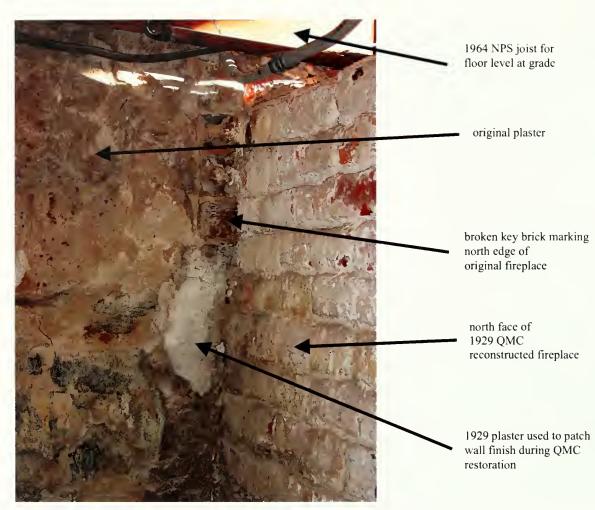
East room, north portion of east wall, 2003. Showing area of wall beneath current grade with evidence of original kitchen fireplace edge, original plaster and alterations made in 1929 when the QMC restored the summer kitchen and reconstructed a fireplace.
